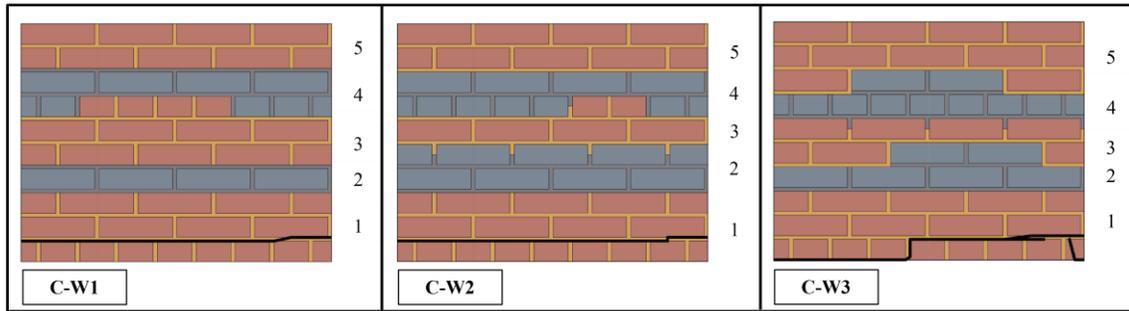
Cracking patterns of wallets C samples for lateral static-cyclic loading tests
